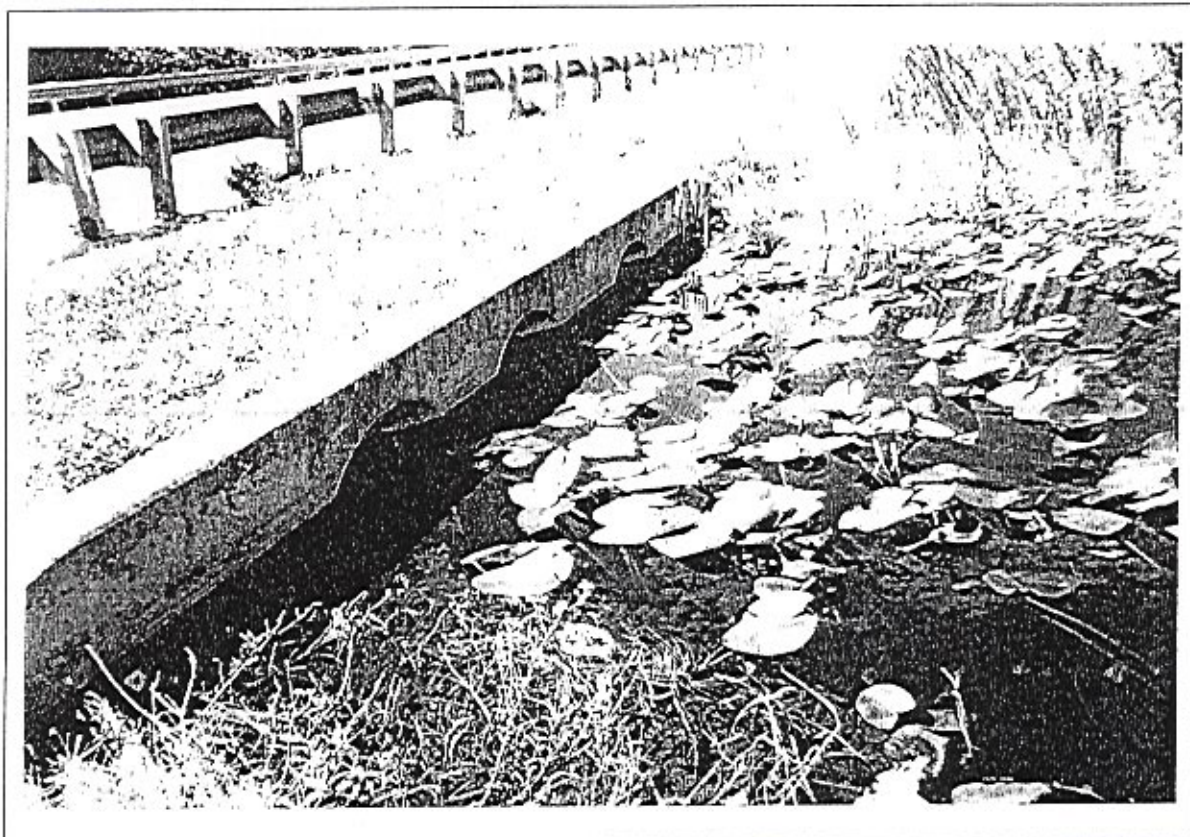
Typical northern culvert opening headwall intaking water from adjacent Tamiami Canal with slow flow through moderate wetland and aquatic vegetation.
